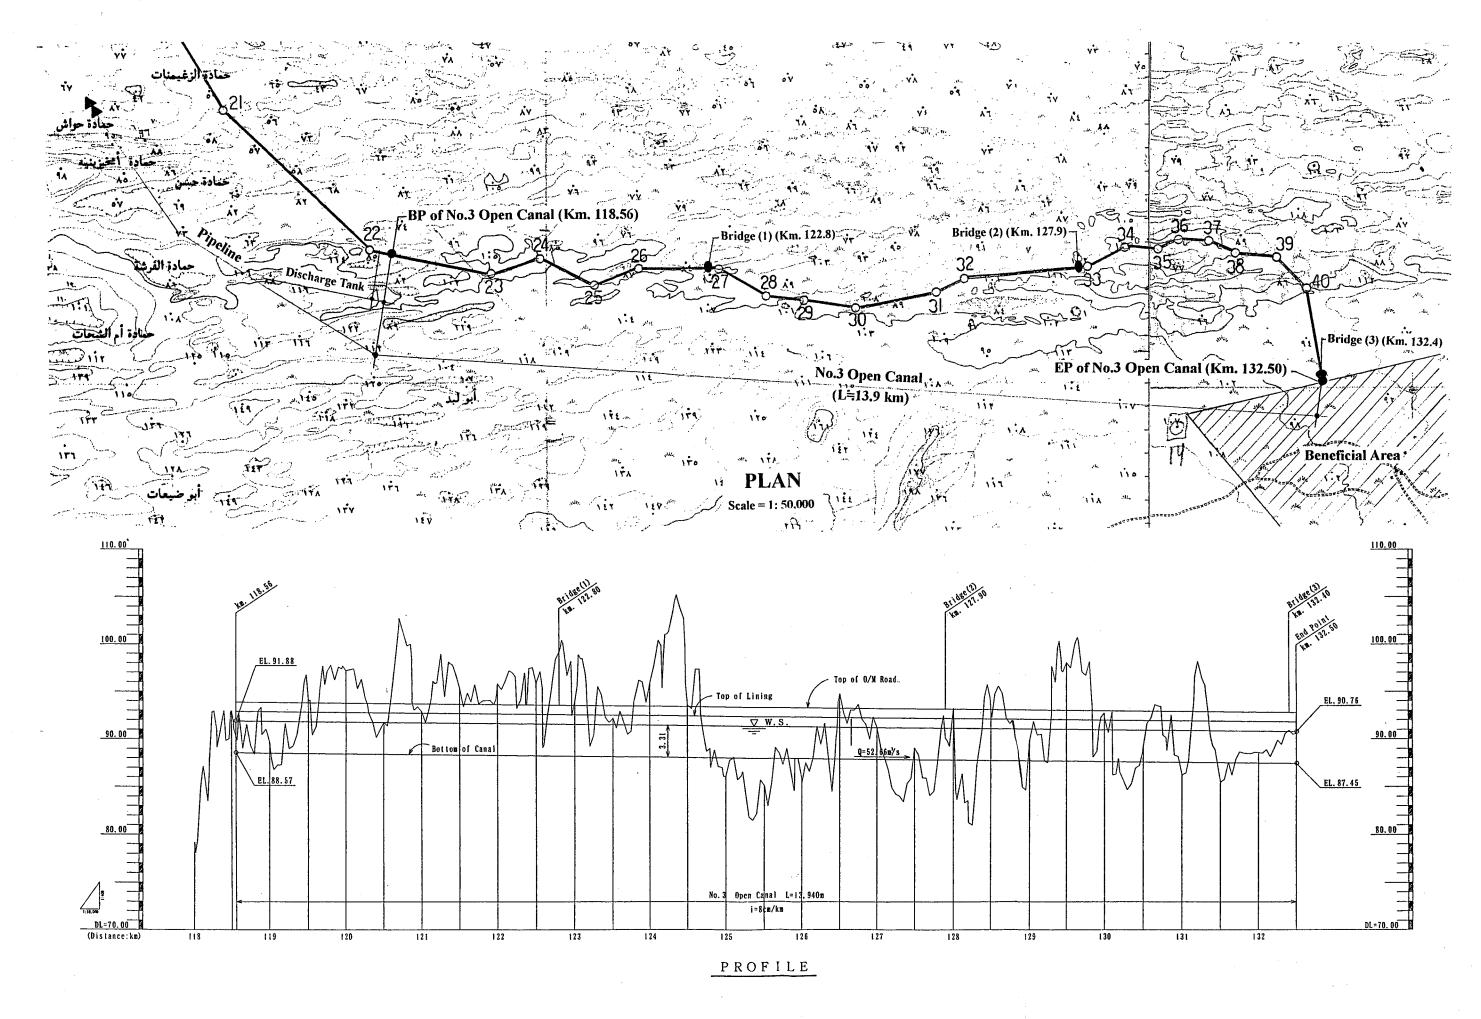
Plan and Profile of No.3 Open Canal
